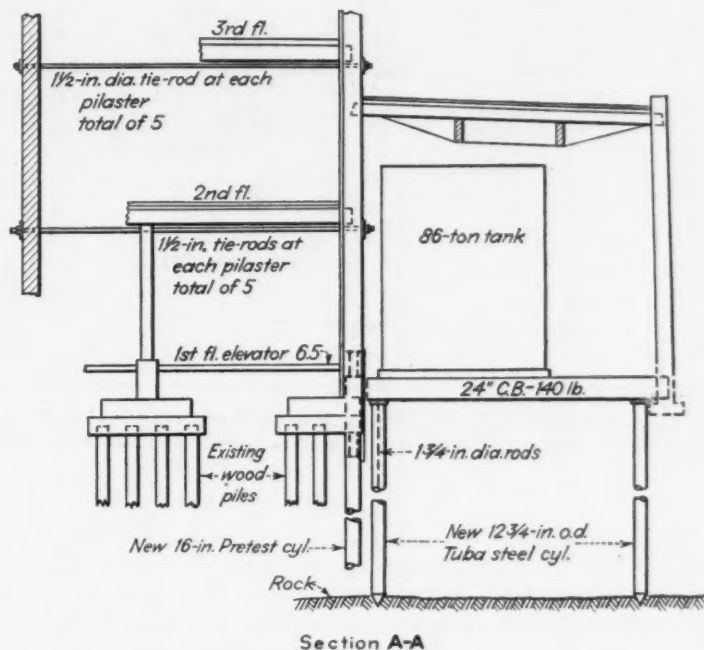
PRETEST CYLINDERS OF STEEL 16 in. dia. were jacked down beneath wall of Building 9 in 4-ft. lengths connected by welded sleeves. Cylinders driven from pits under existing wall are pre-tested to 90 tons, or 50 percent over design load.
